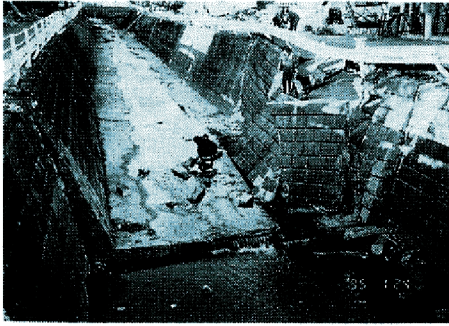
Collapse of concrete-block revetment of Tenjo River in Kobe
